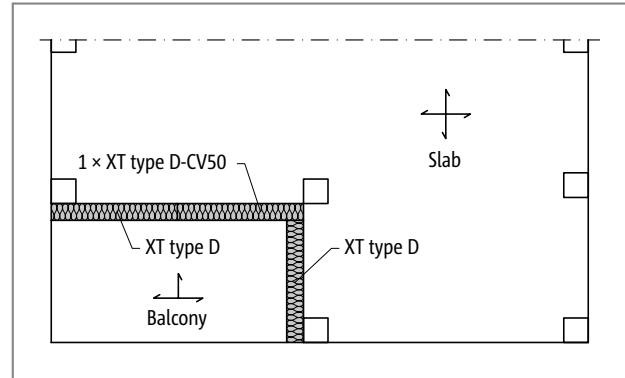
Schöck Isokorb® XT type D: Two-way spanning
